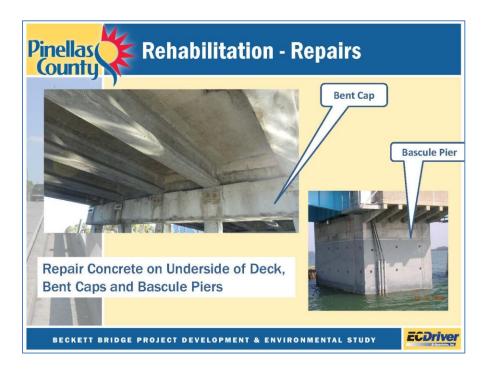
Rehabilitation Repairs – Concrete Repairs to Underside of Deck, Bent Caps, and Bascule Piers
